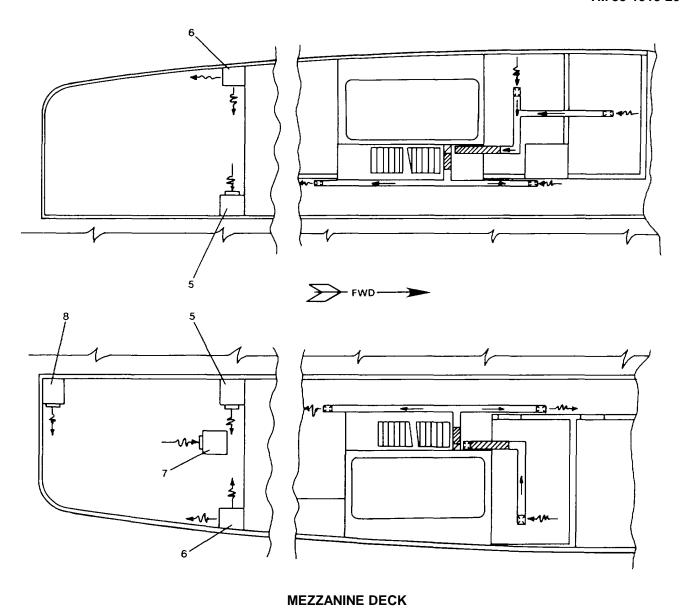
<u>Ventilation Ducting - Mezzanine Deck (Sheet 3 of 6).</u>
